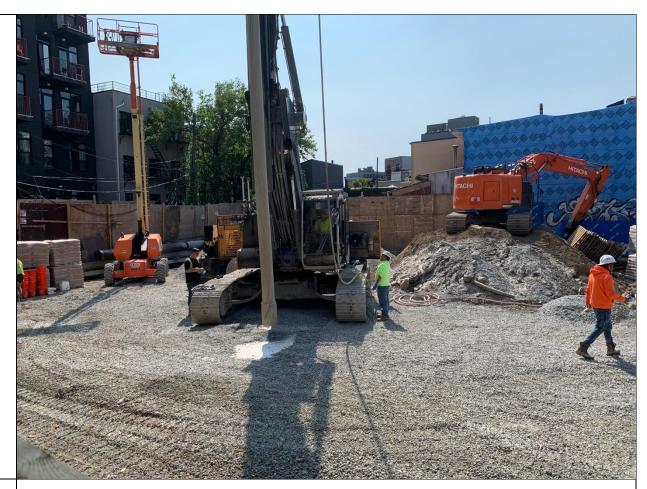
A look at drilling that was occurring in grid B1, at around 2:15 p.m.
